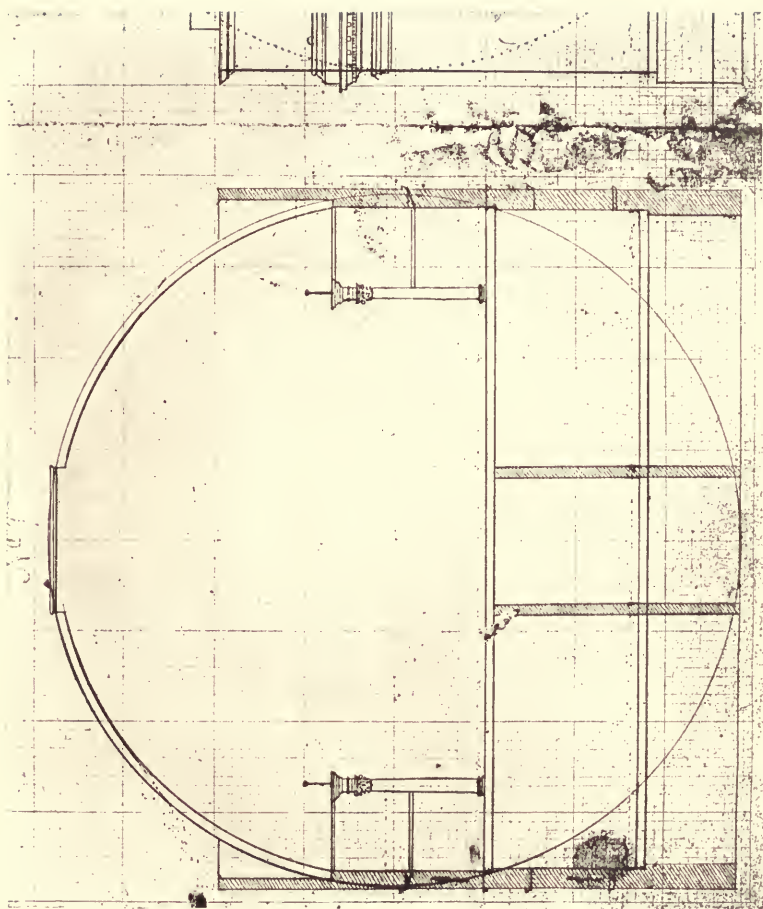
PLATE XVI. Plan of first and second floor of Library or Rotunda.
